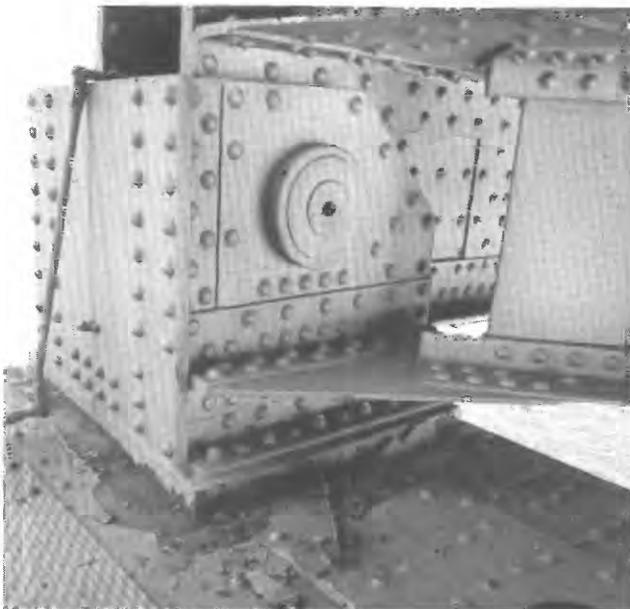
Truss shoe at Pier E9 of the East Bay Crossing showing broken bolts and shoe movement after earthquake.
